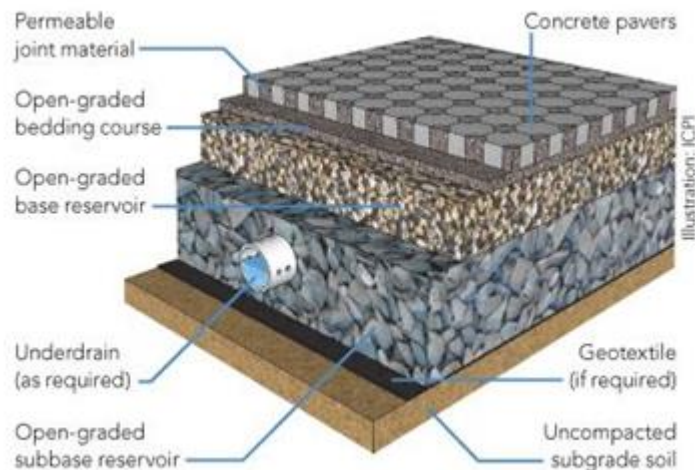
Cross-section of a PICP stormwater pavement system. Source: ICPI
